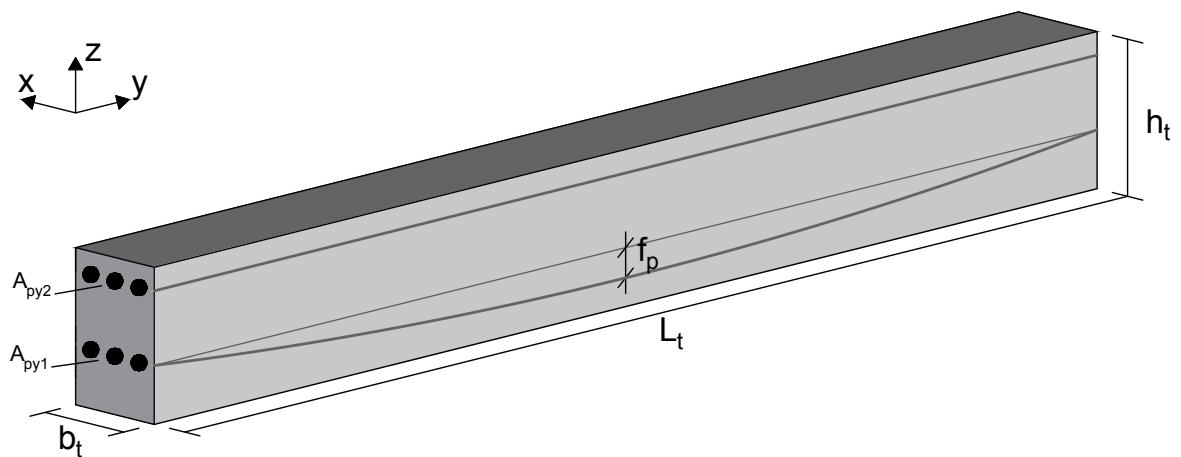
Massive side girders with the prestressing cables indicated (not to scale)
